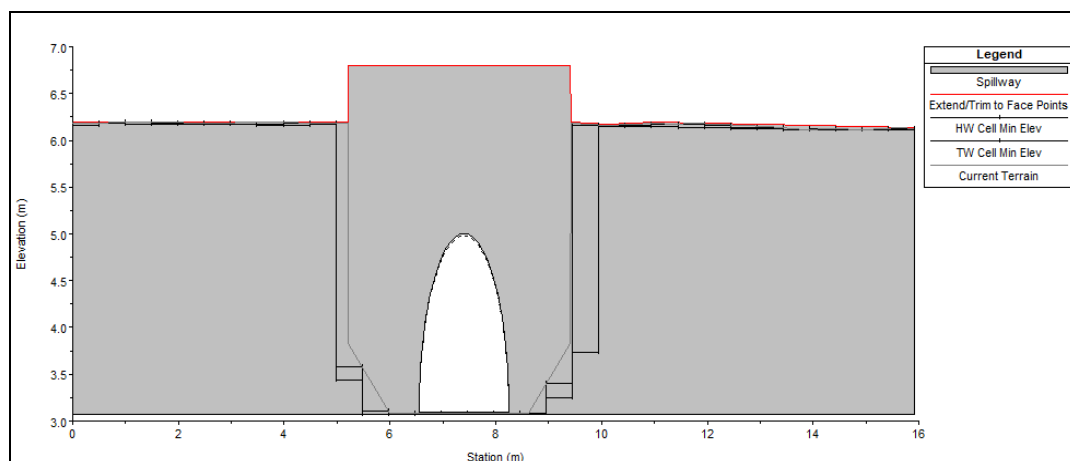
D HEC-RAS Structure – Upstream Bridge
